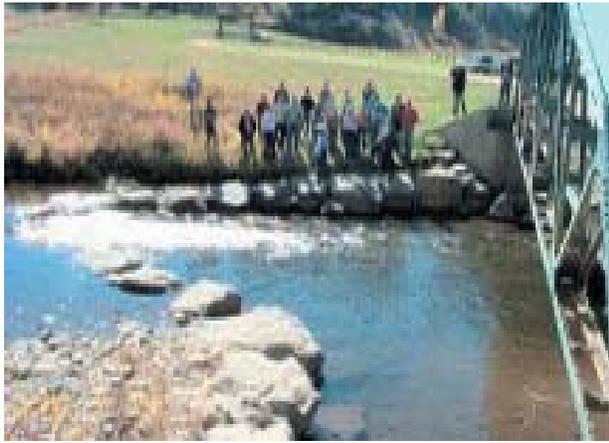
Dave Rosgen describing the installation and benefits of a modified cross-vein to protect the ranch access bridge.
